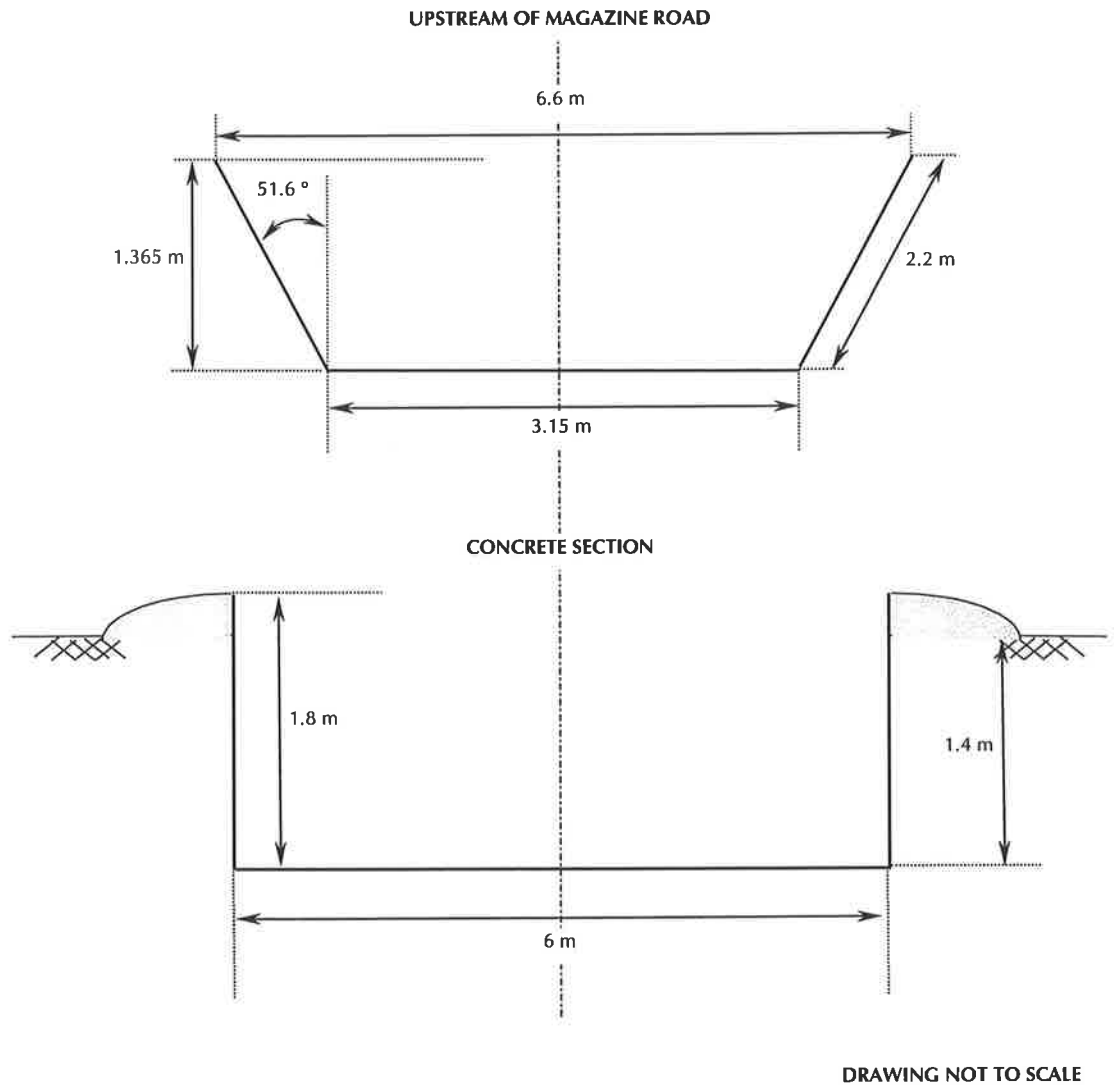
Dimensions of the Henschke Street Drain; upstream of Magazine Road (top) and downstream of Magazine road (bottom).
